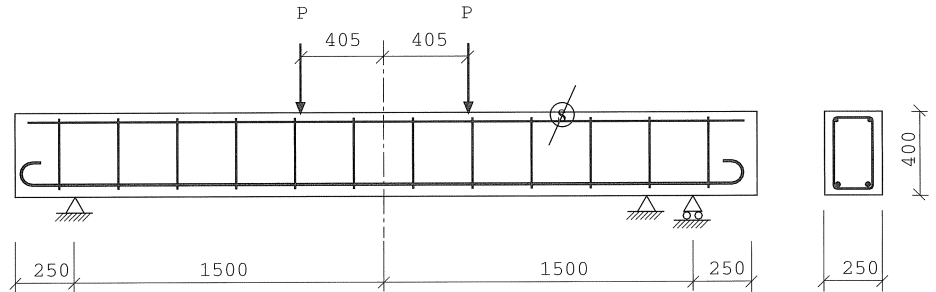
Concrete reinforced beam and loading condition, measures in mm.
